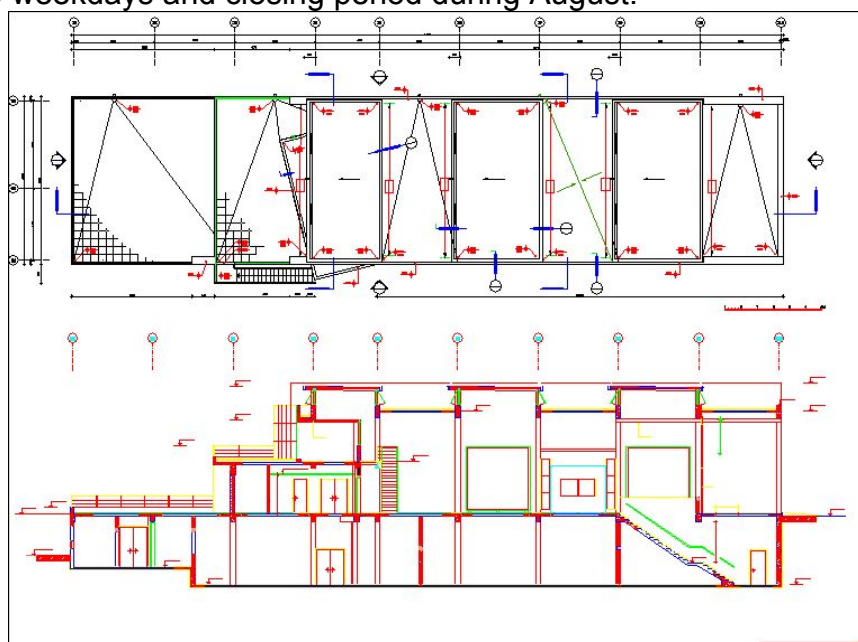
the top view of the flat roof(drawing 1b) and the cut view (drawing 2b).
